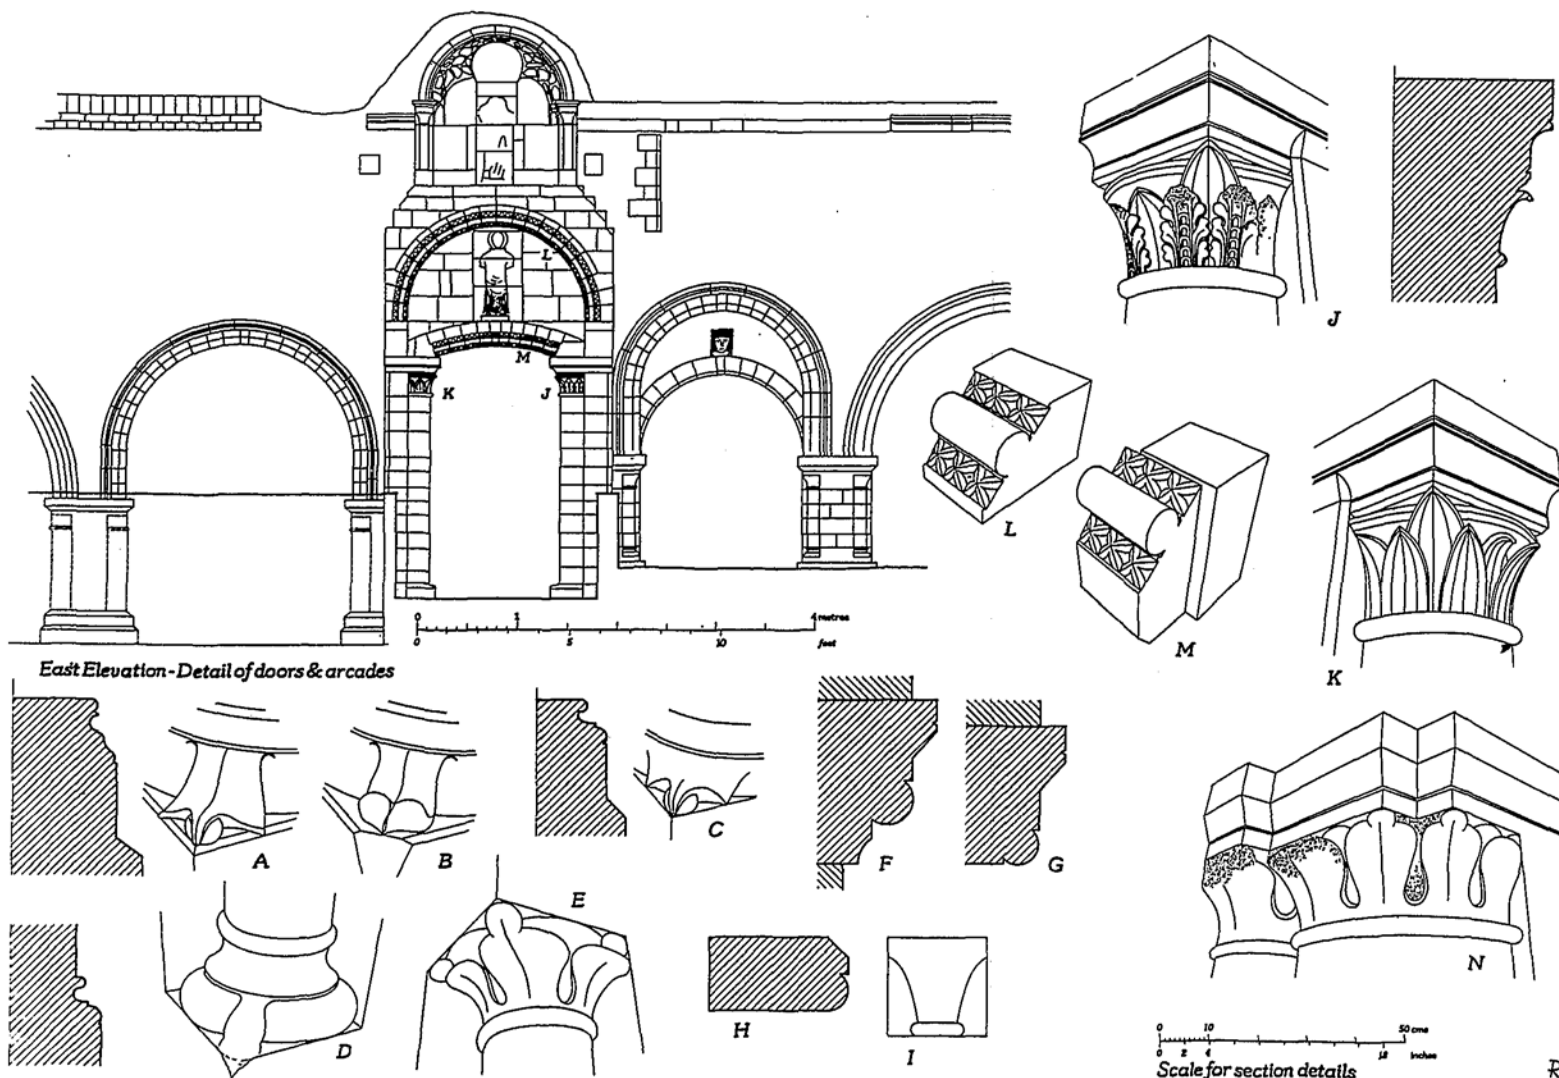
Domus Hospitum, Christchurch Priory: Details (Scale, Elevation: 1:80; Details: 1:16).
